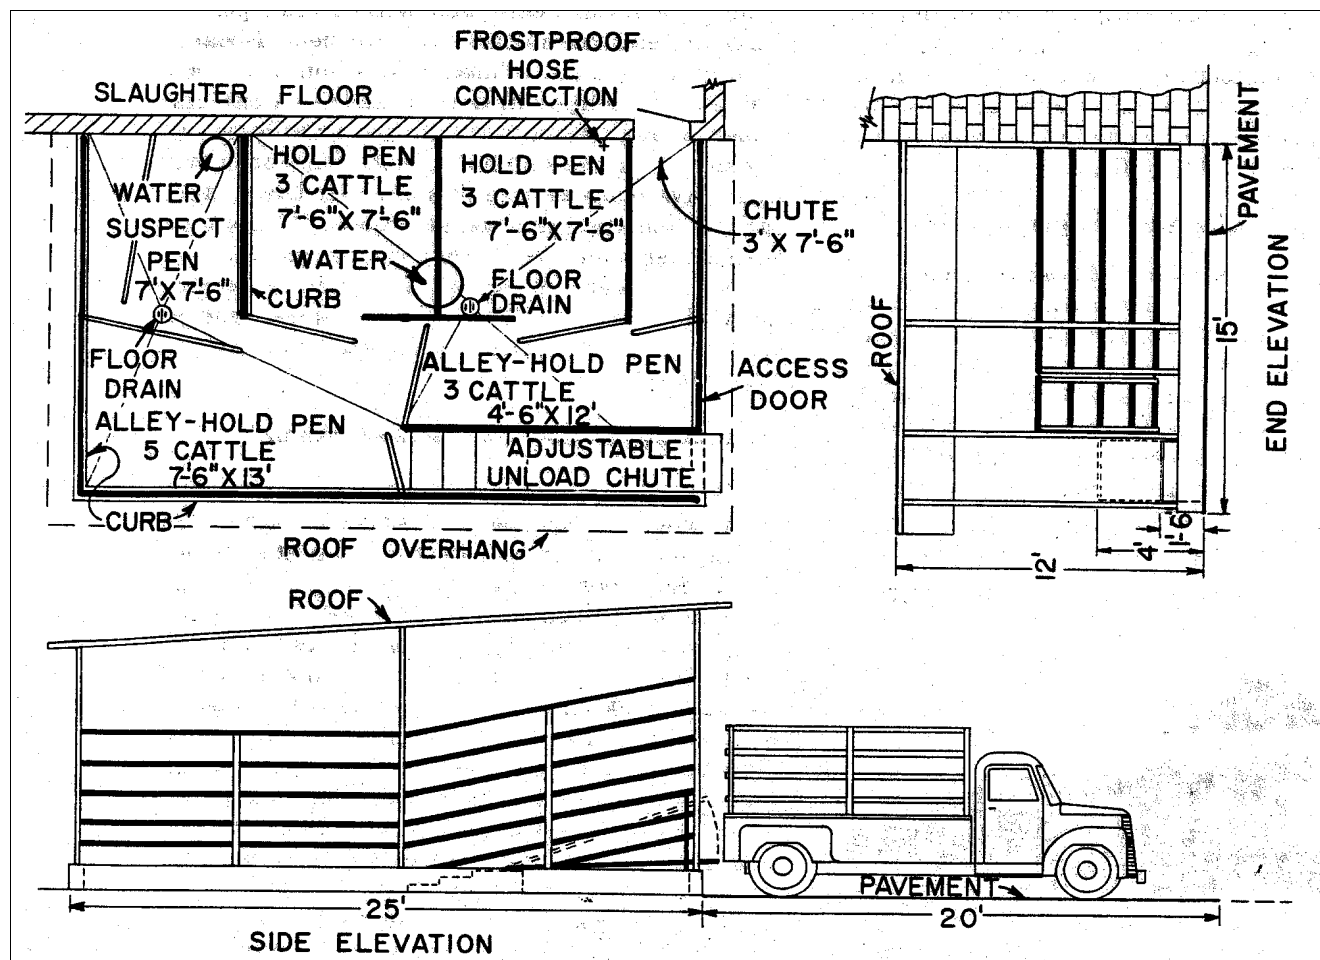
Adjustable-height unload-chute and hold-pen layout.
